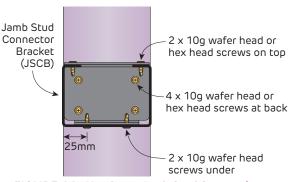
Header to Jamb Stud ConnectionWith Jamb Stud Connector Bracket
